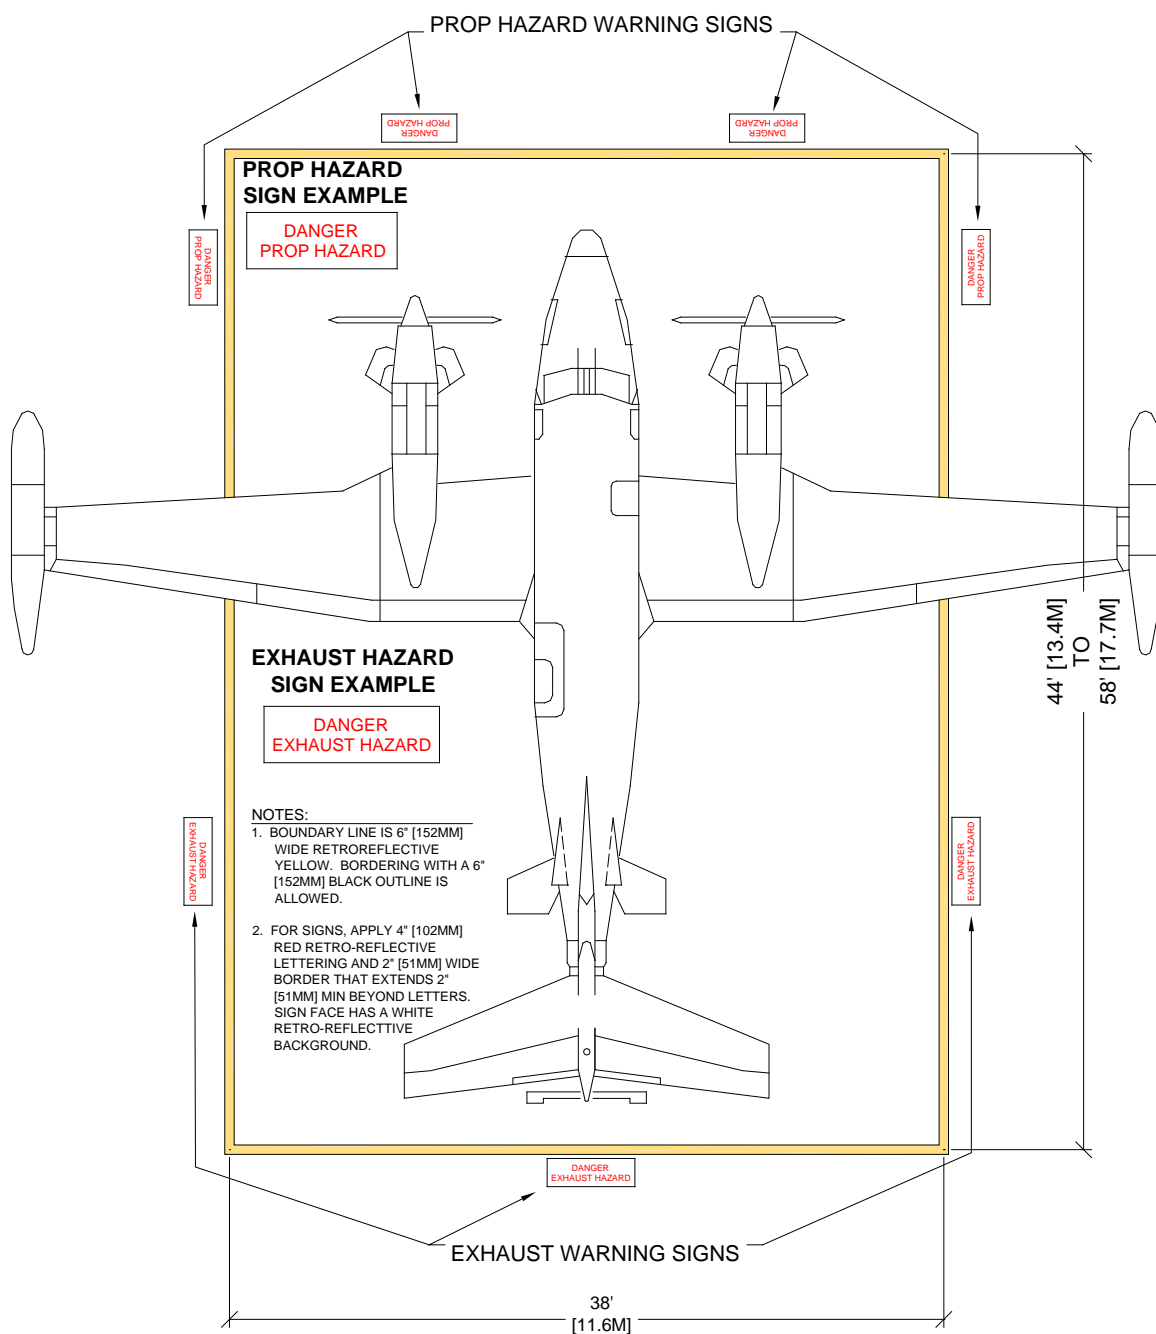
C-12 Propeller and Exhaust Hazard Area Pavement Markings
